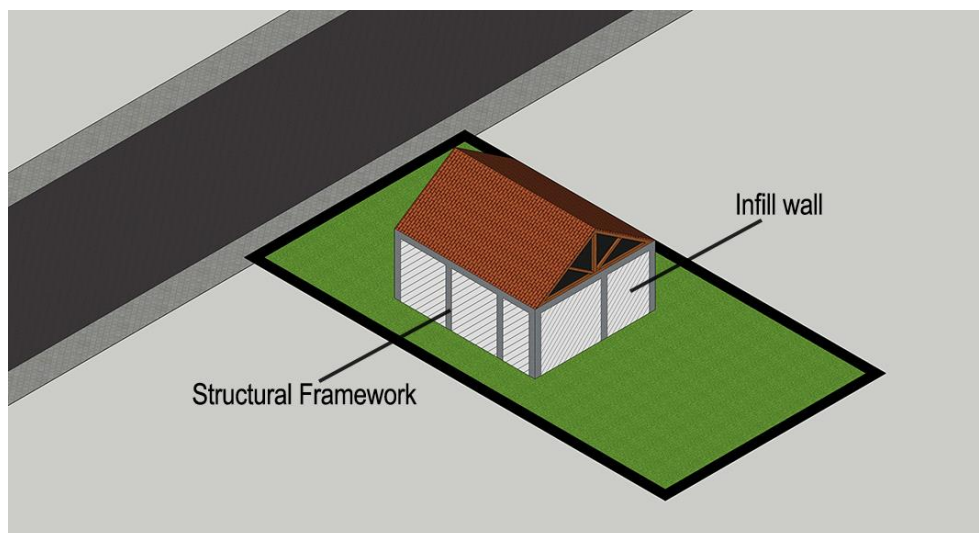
Sample model of a house with structural framework and infill walls.
